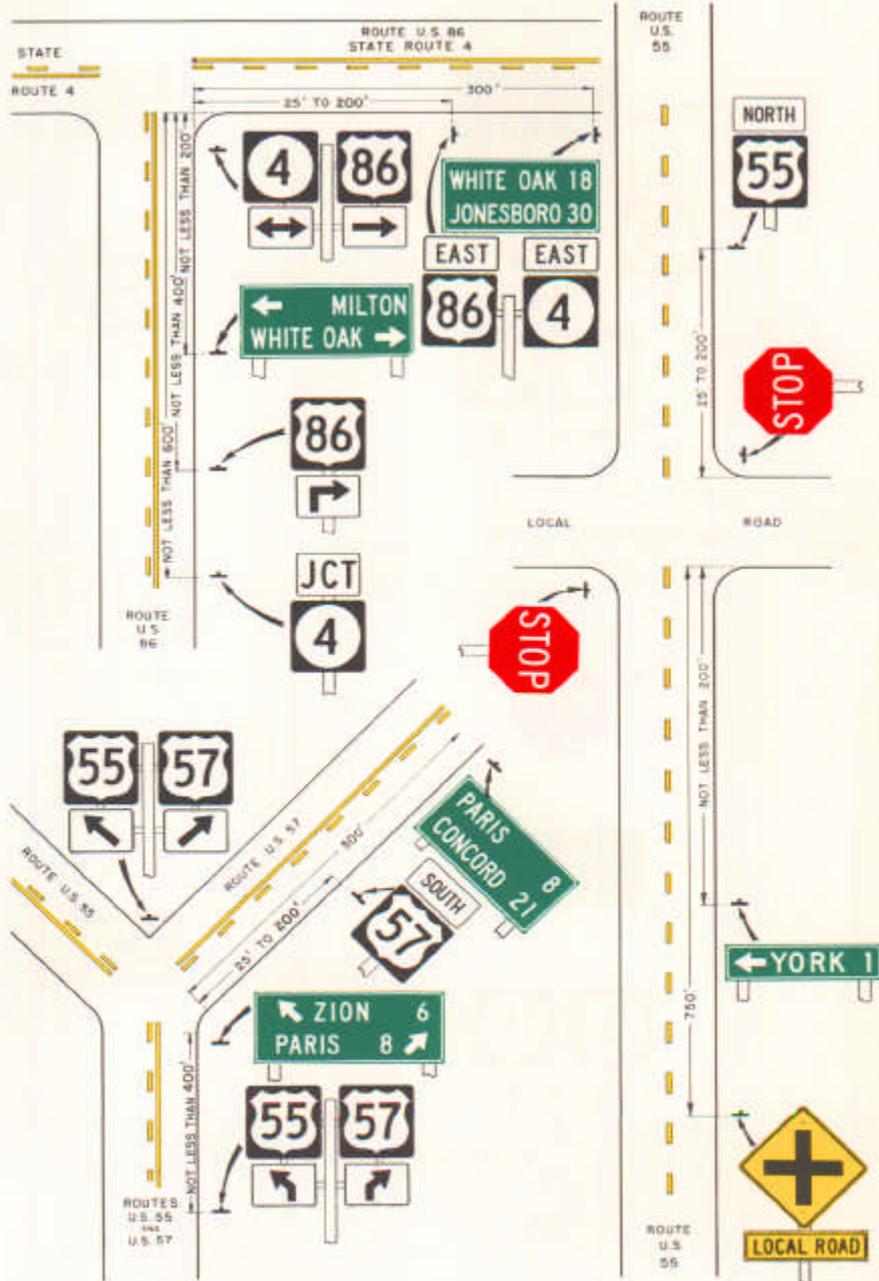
Typical route markings at rural intersections (for one direction of travel only).
